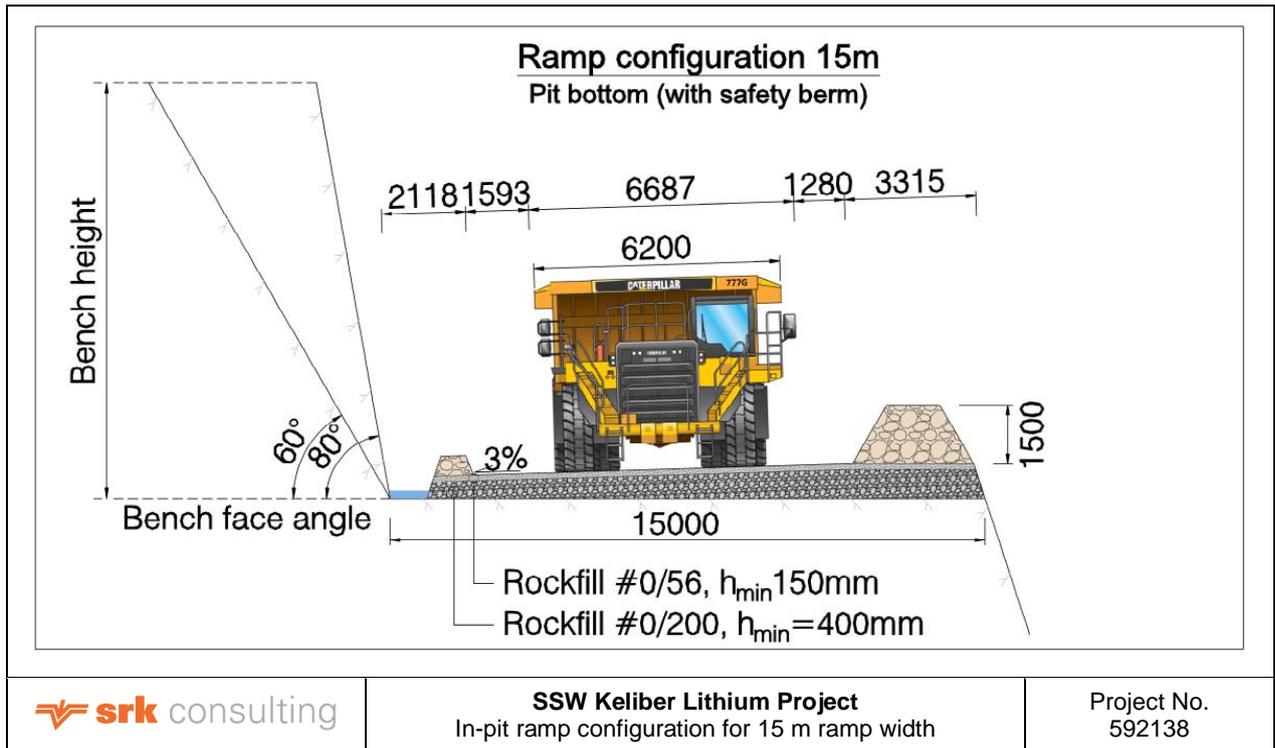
In-pit ramp configuration for 15 m ramp width
